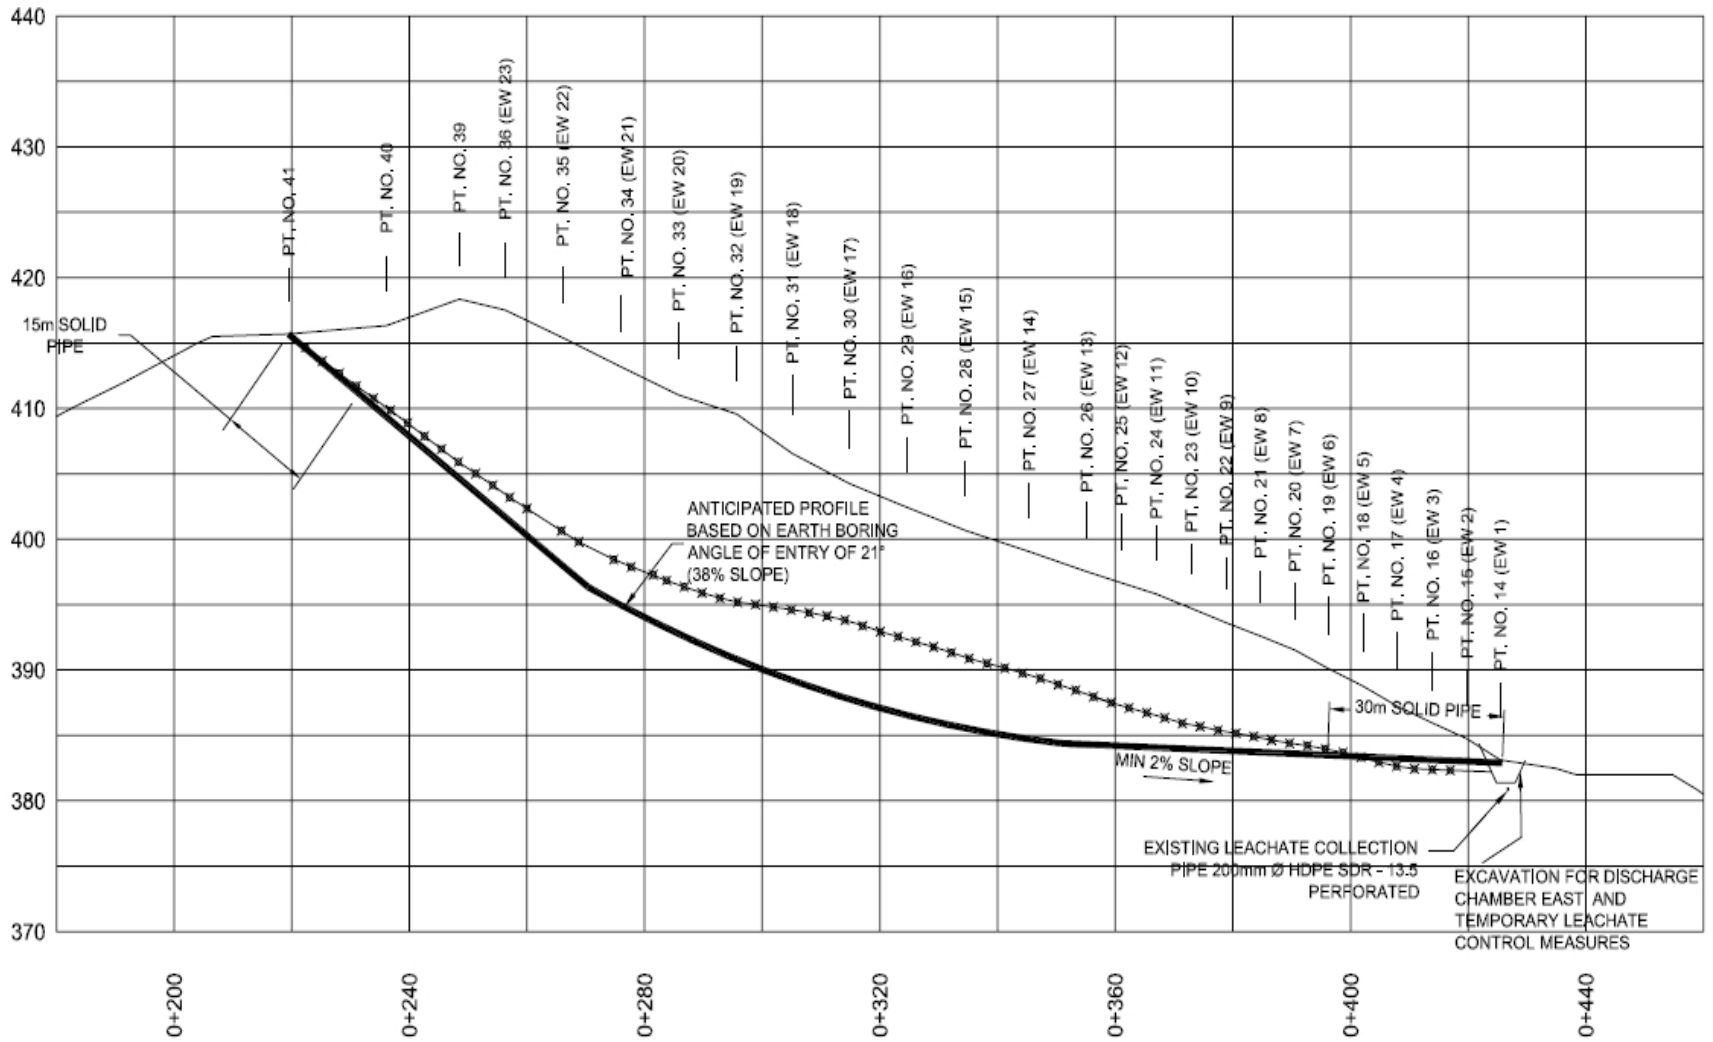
East Well Drill Plan and Actual Pilot Bore Path Profile.
